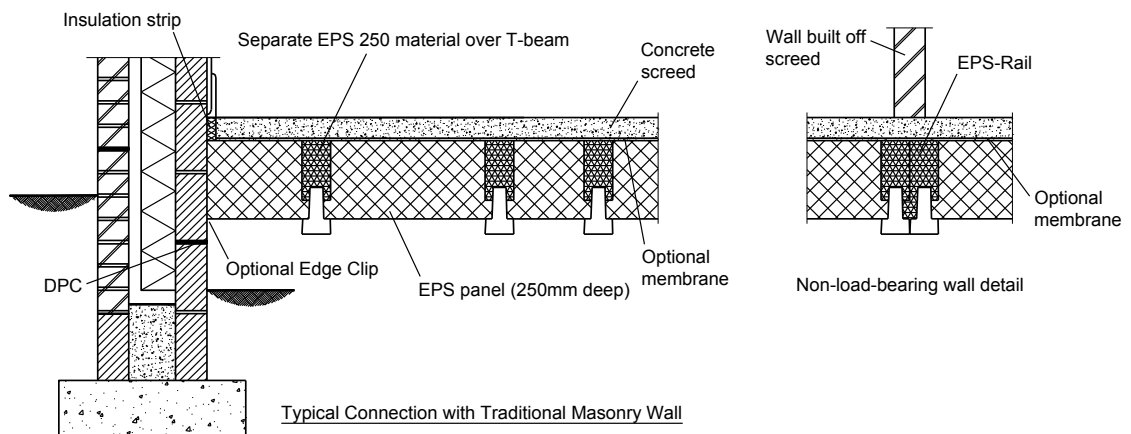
The Gdeck R1 EPS Panel System – GT detail 15 Floor/Wall Junction – depth 230 mm
